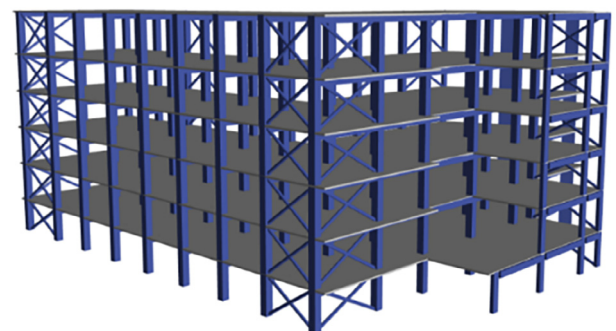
Retrofitting by adding steel bracing, Model 3.
